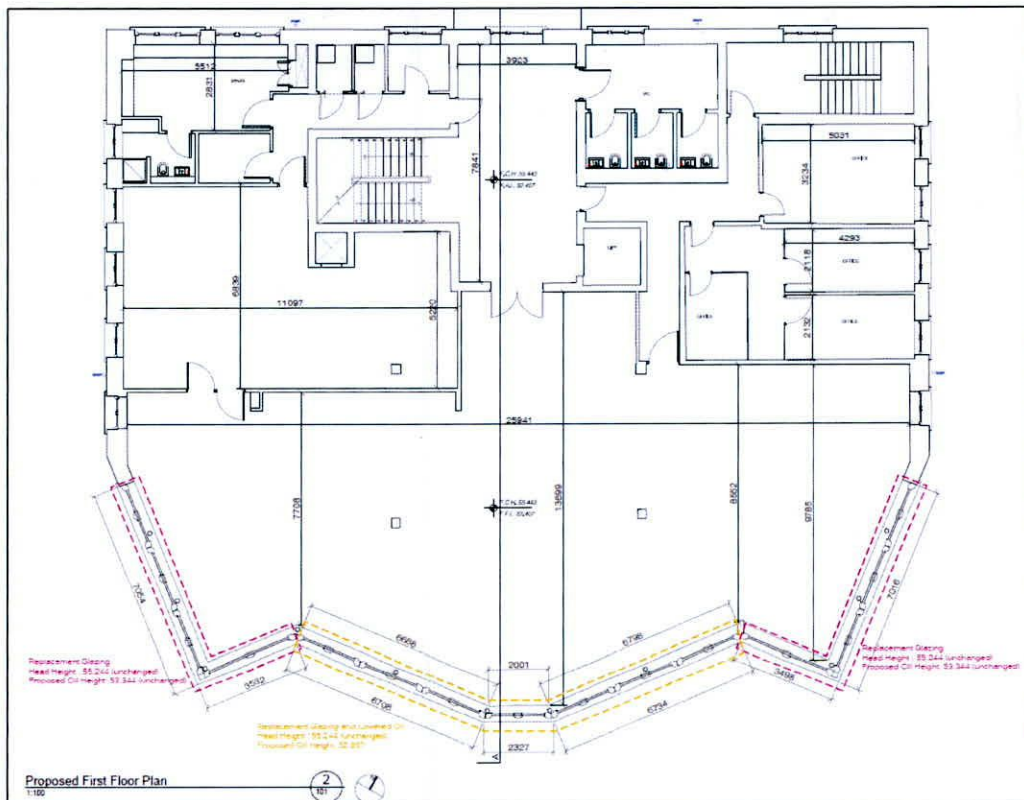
Drawing P937-101 Proposed First Floor Plan (Source: NBK)
